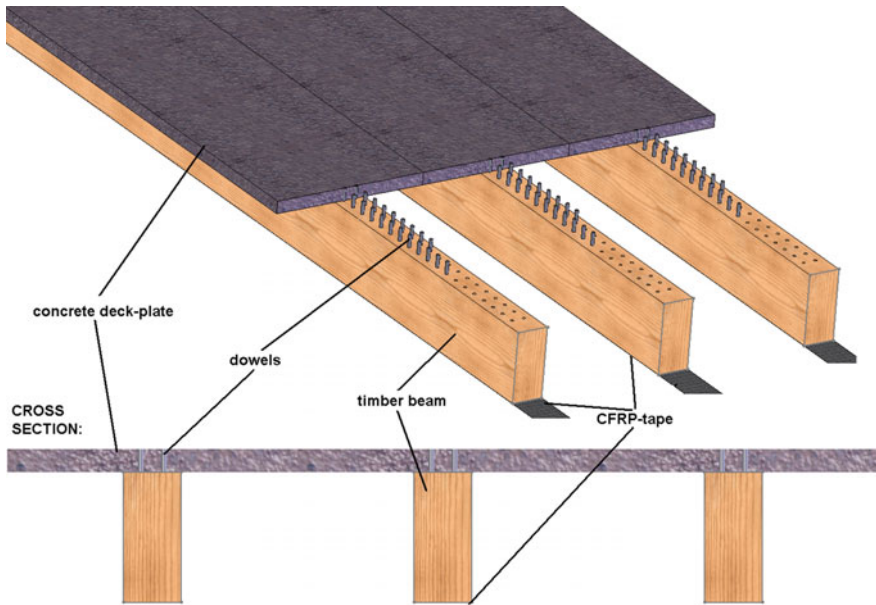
Types of reconstruction of old timber floors with a concrete slab and additionally with CFRP strips [70]
